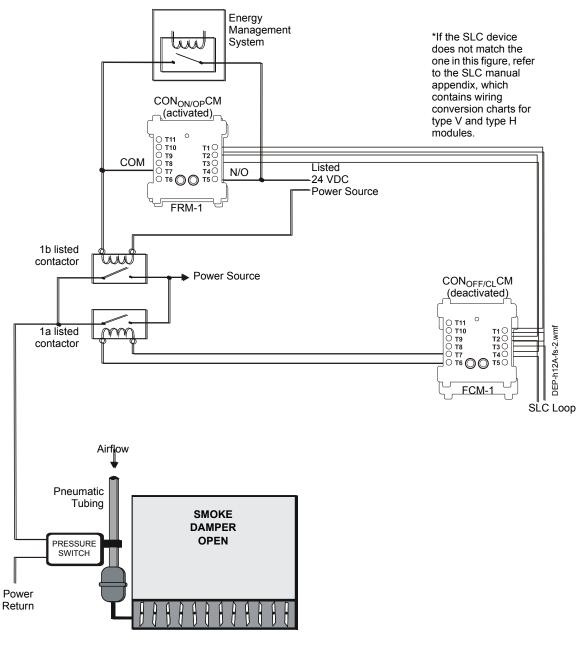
EP Damper Control - HVAC Switch Group Type 11
